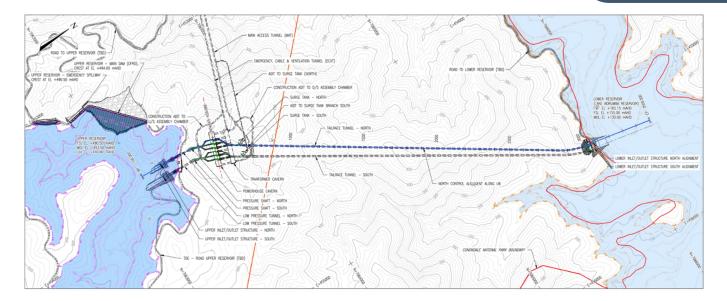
Water tunnels connecting upper and lower reservoirs via the underground power station
